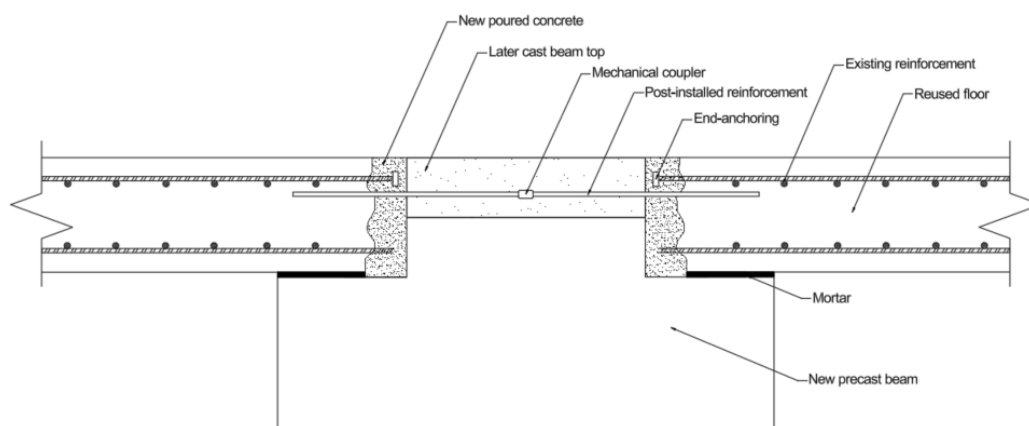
Design proposal of a fixed beam-slab connection option 1
